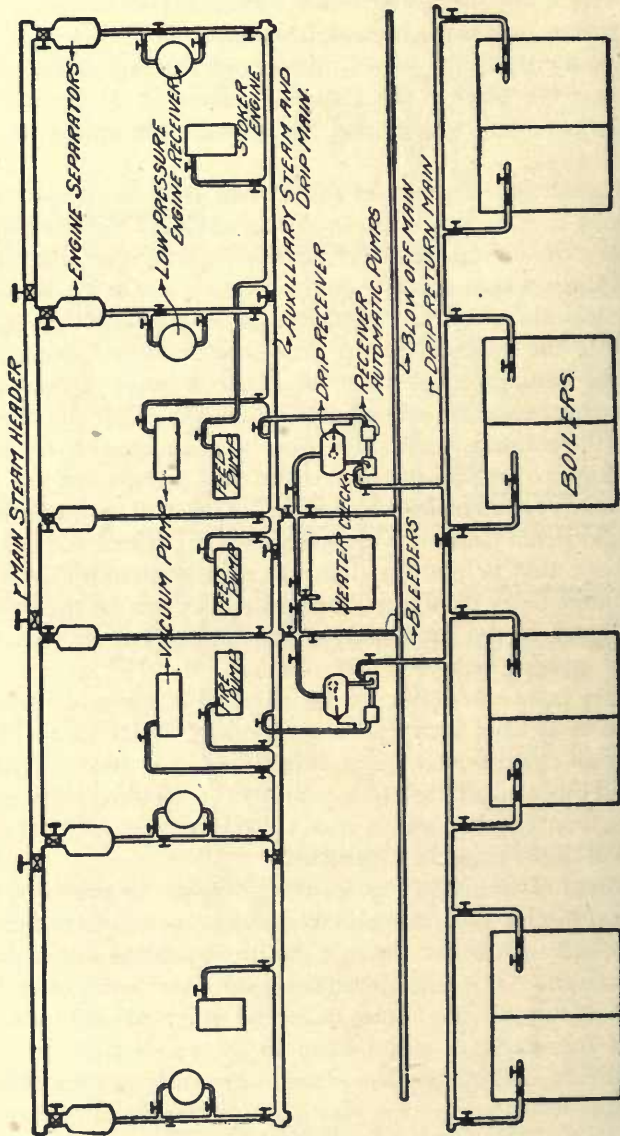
System; Steam, Boiler Feed, and Receiver Pump Drip Return.
